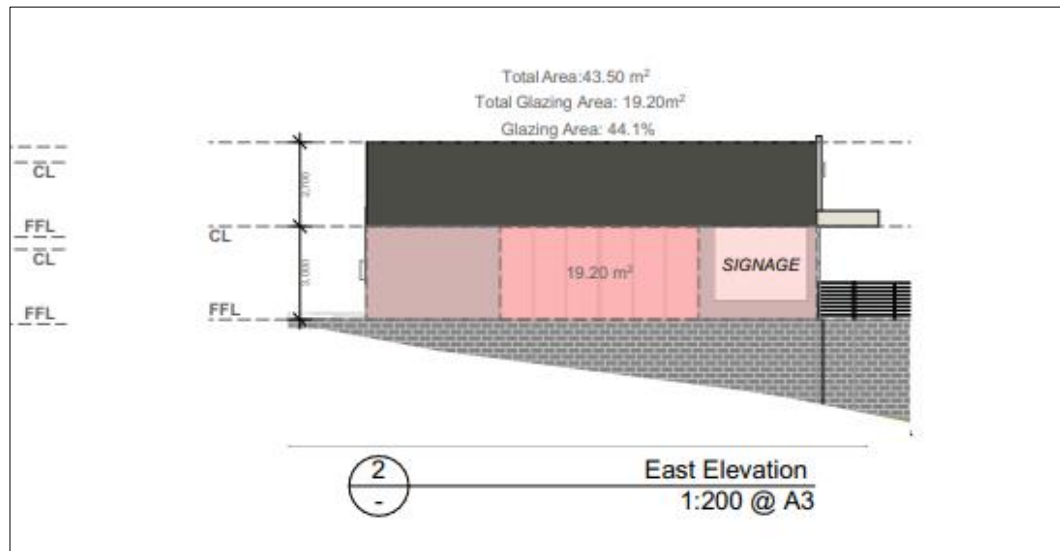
Elevation plan showing the areas of proposed glazing facing Maranoa Road
